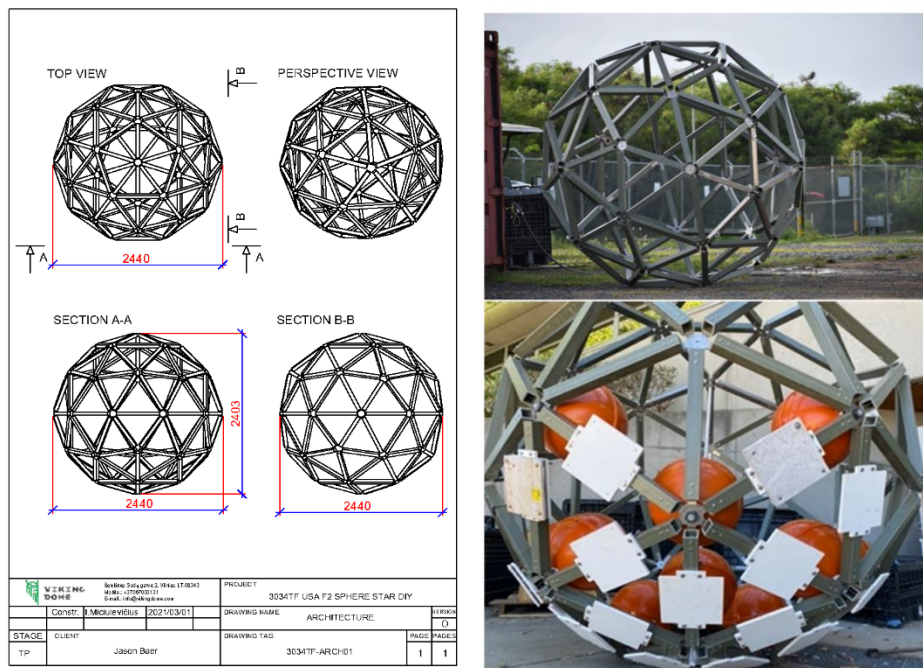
Assembly of a 2V geodesic sphere. (Left) Technical drawing for complete assembly of 2V geodesic sphere (adapted from Viking Dome assembly materials). (Right) Images of a fully assembled sphere.
